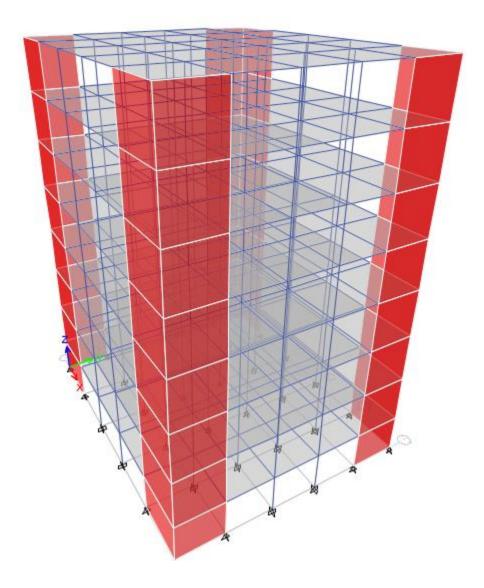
3D View of the Model with Shear Wall at Four Corners
